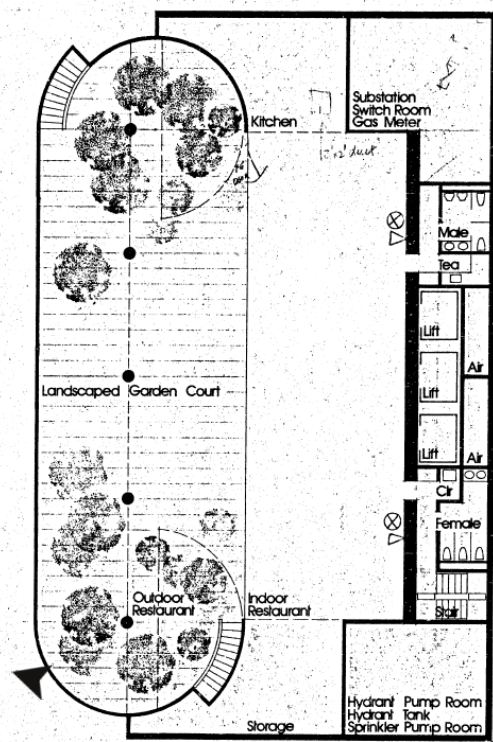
Basement floor plan, stamp dated 1974 (BAP).
